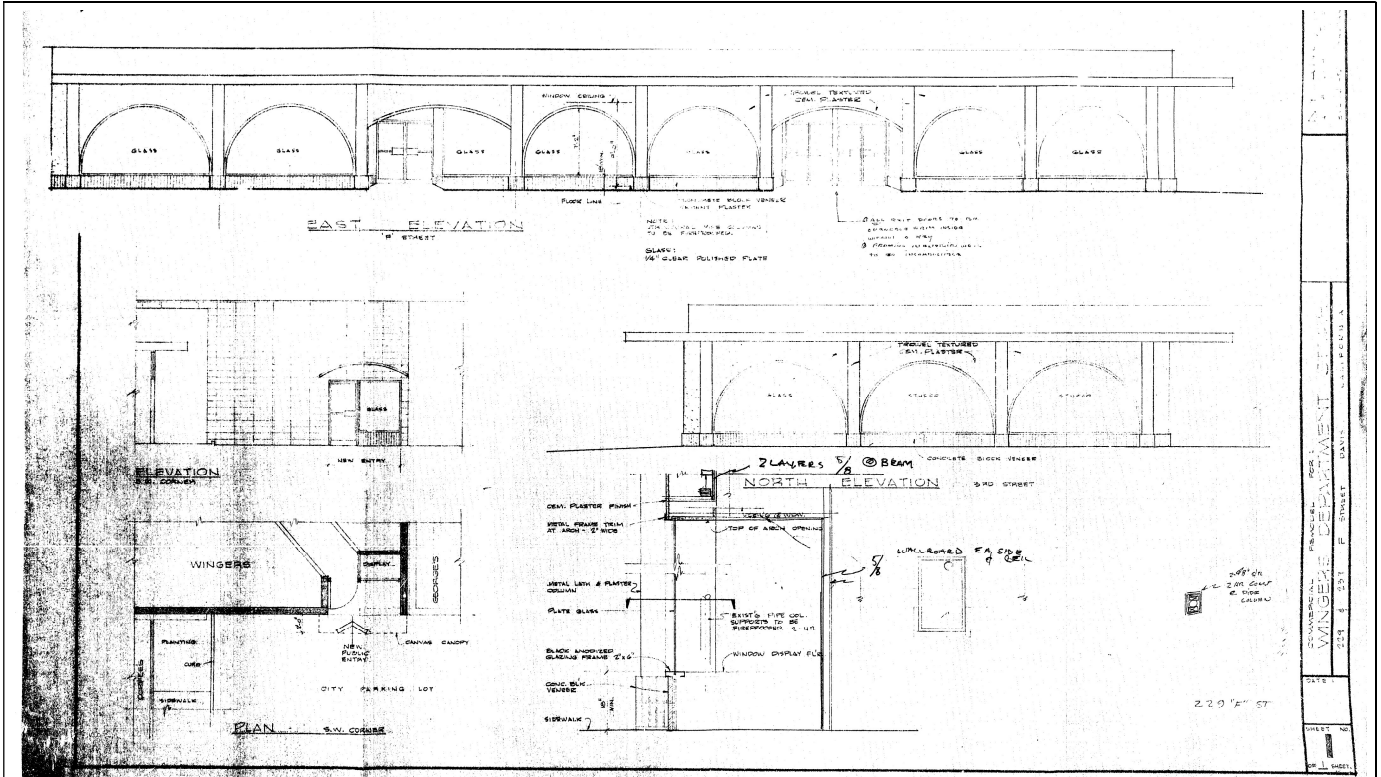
1970 Architectural plans for the Winger Building Remodel
